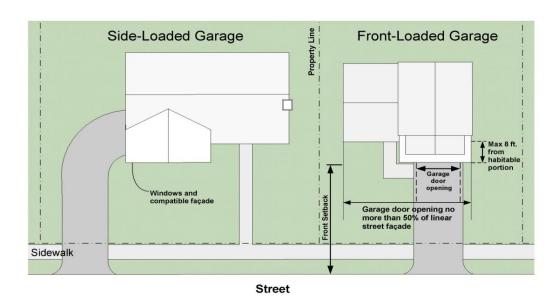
Attached Garages - Front and Side Loaded; 17.6.2.1:F.4.d
